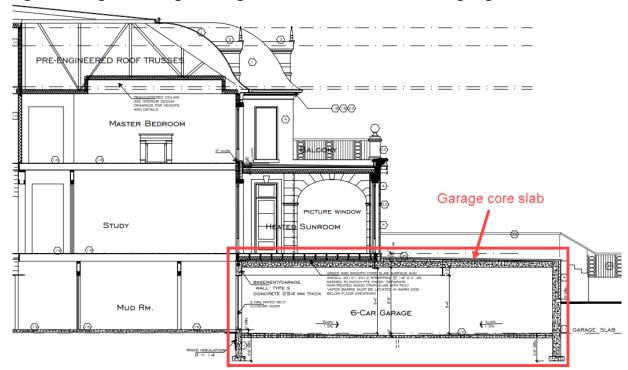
Original drawings showing concrete core slab to be used for garage roof
